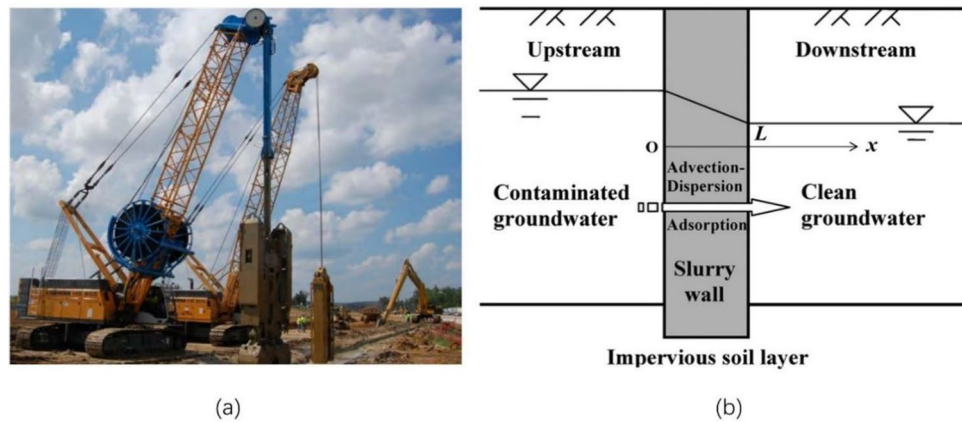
Configuration of a cutoff trench cutoff wall: (a) photograph of the excavation process³⁴; (b) contaminant transport through the wall. In the simulation of actual engineering seepage, a cutoff wall backfilled with homogenous, fully saturated and nondeformable slurry is embedded into the impervious soil layer, and the seepage action of the actual anti-seepage wall is intuitively illustrated through a diagram.
